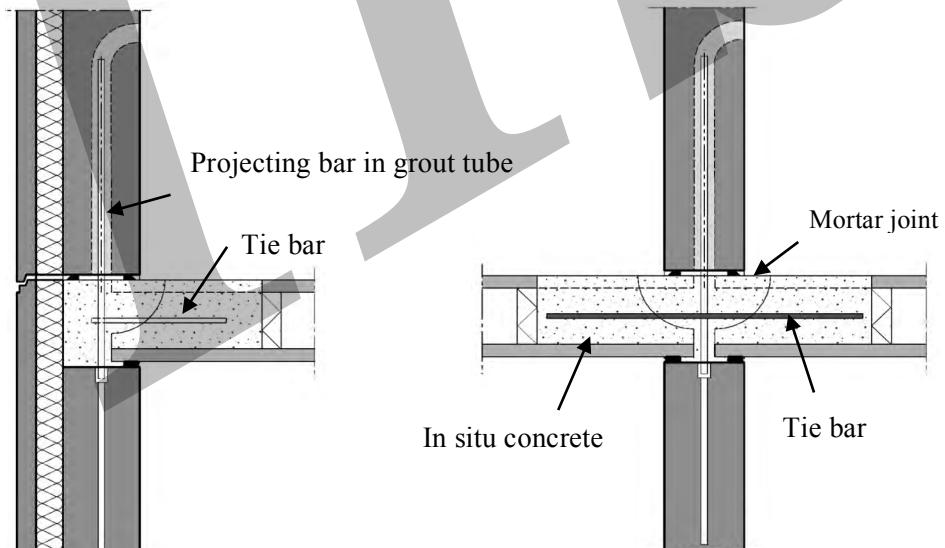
Typical connection between wall and floor for buildings higher than 10 storeys
